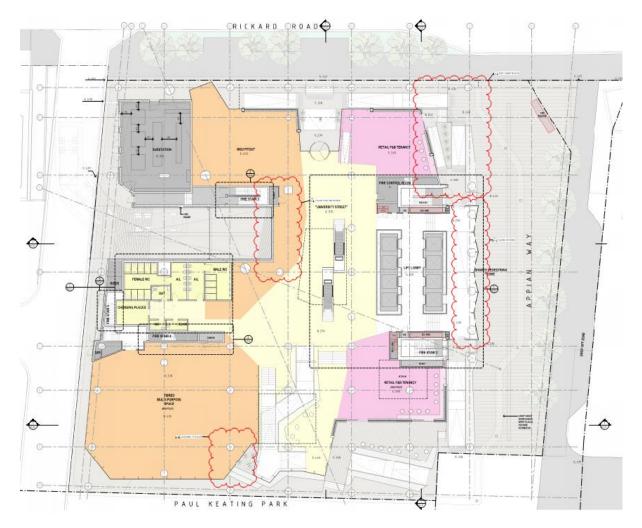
The Architectural Site Plan – Ground Floor (by Lyons Architects)
